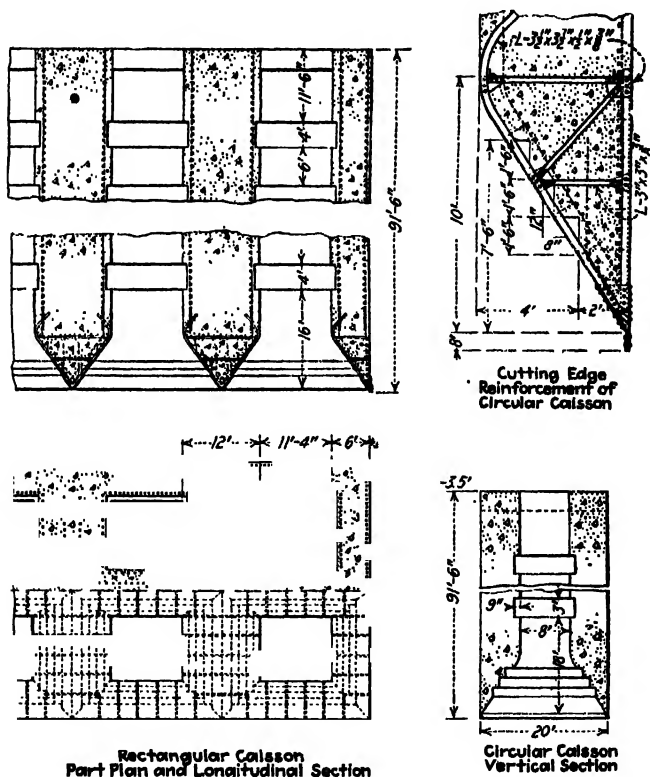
Camden Anchorage Caissons, Delaware River Bridge.
